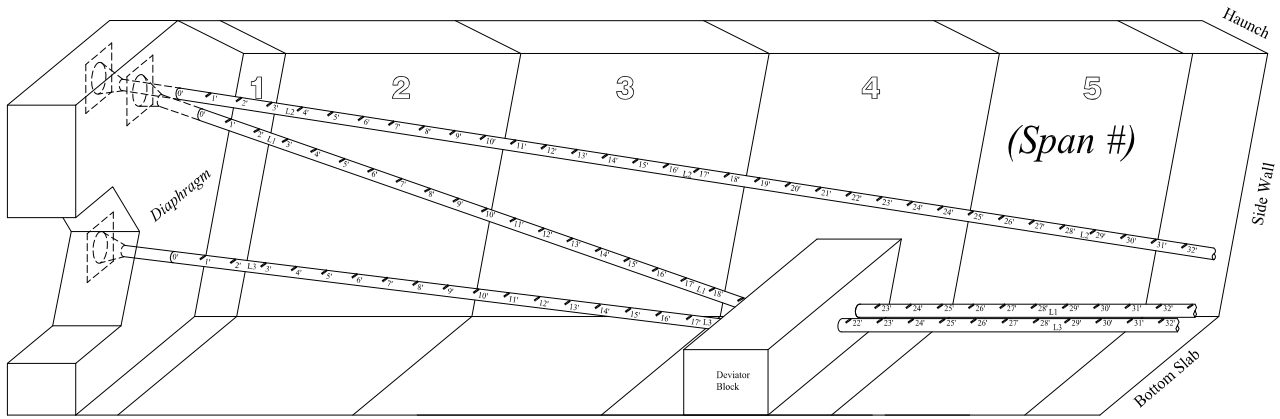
An Isometric Interior View of a Bridge Girder (after Surveying).
